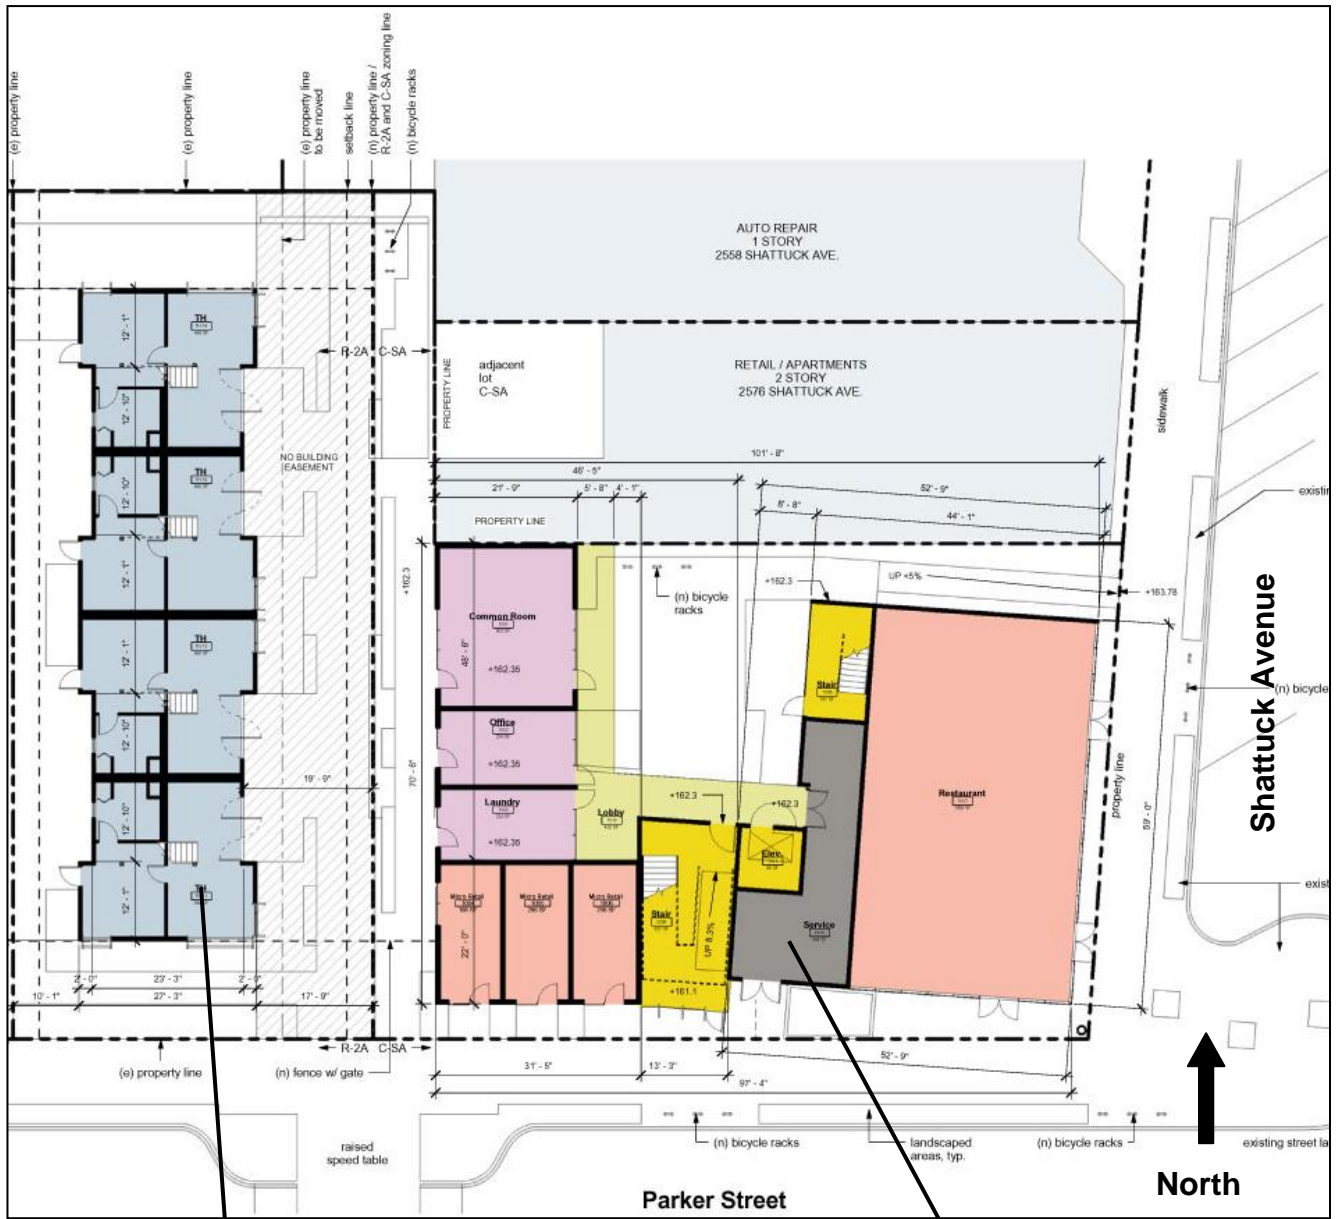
Site Plan—2598 Shattuck/2037 Parker
